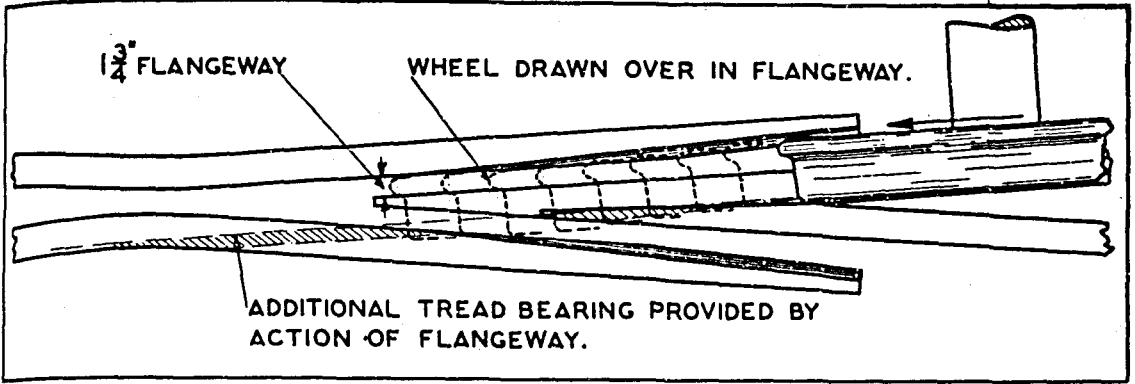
WHEEL DRAWN OVER BY FLARED GUARD WING.
